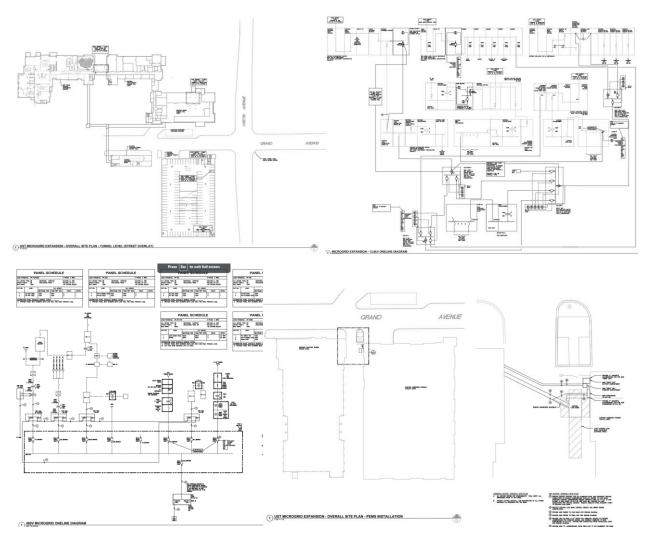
Top left: site plan showing the 5 main buildings and the utility tunnel. Top right: Building retrofits and high voltage loop. Bottom left: current switchgear retrofits. Bottom right: Installation of new energy storage system (PEMS 30kW/60kWh).
